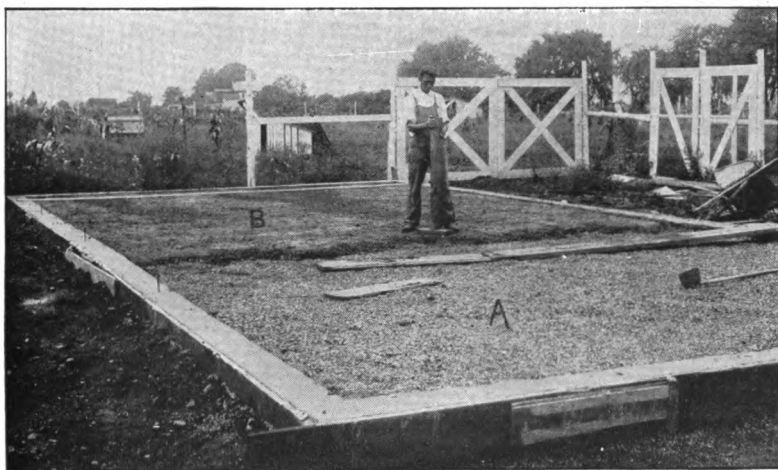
Foundation wall complete, showing process of laying the floor: A, Cinder subgrade; B, Rough coat concrete.
